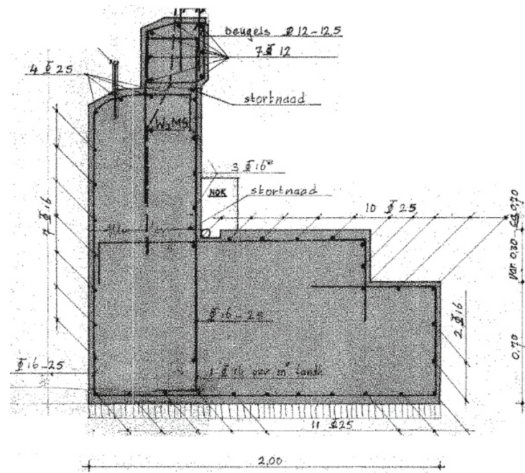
Reinforcement in existing abutment (1973) according to strut and tie model
